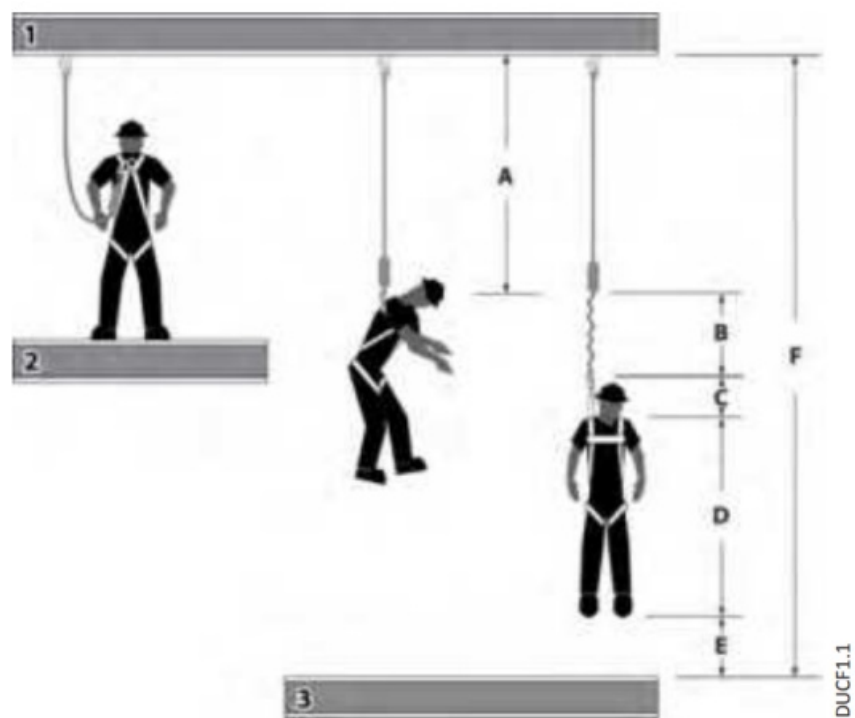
Minimum Clear Fall Requirement: 6 ft Shock Absorbing Lanyard
